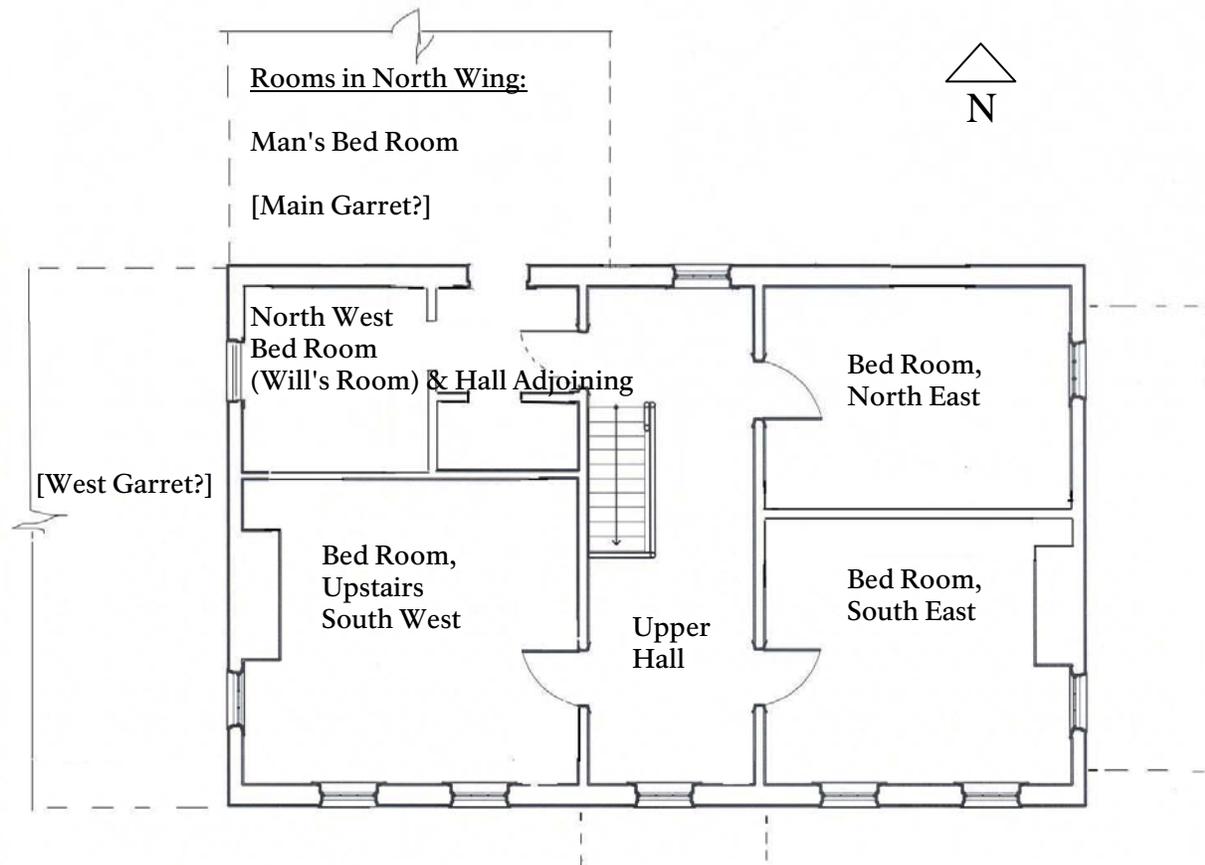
Conjectural second floor plan of the Hunt House, 1889. Room names are from the 1890 probate inventory of Jane Hunt. Not to scale.
